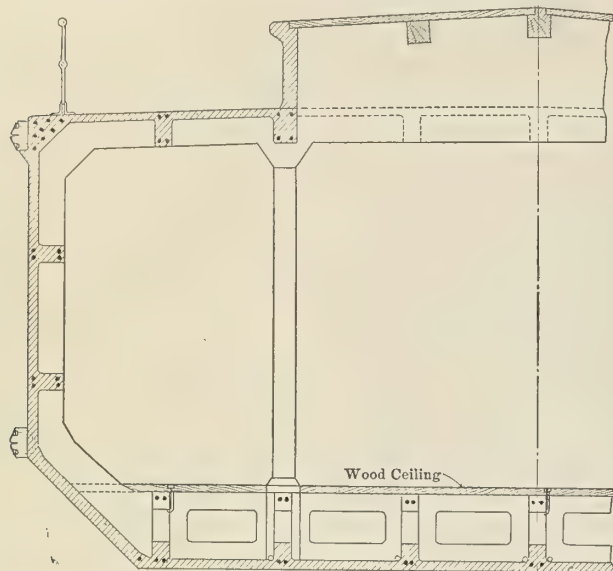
Midship Section of 500-Ton Reinforced Concrete Coaster
